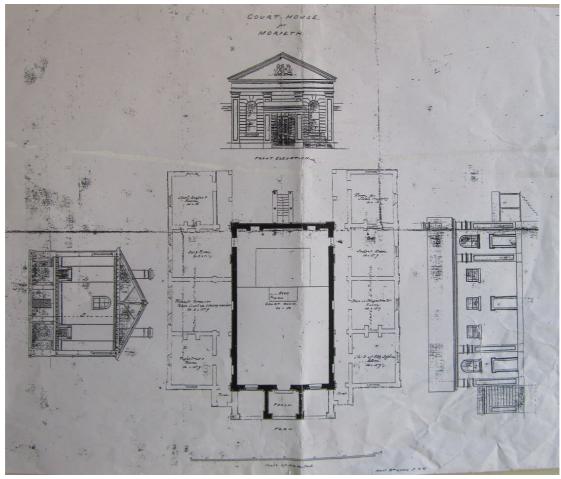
The 1860 Morpeth Court House Plan (Source State Archives)
